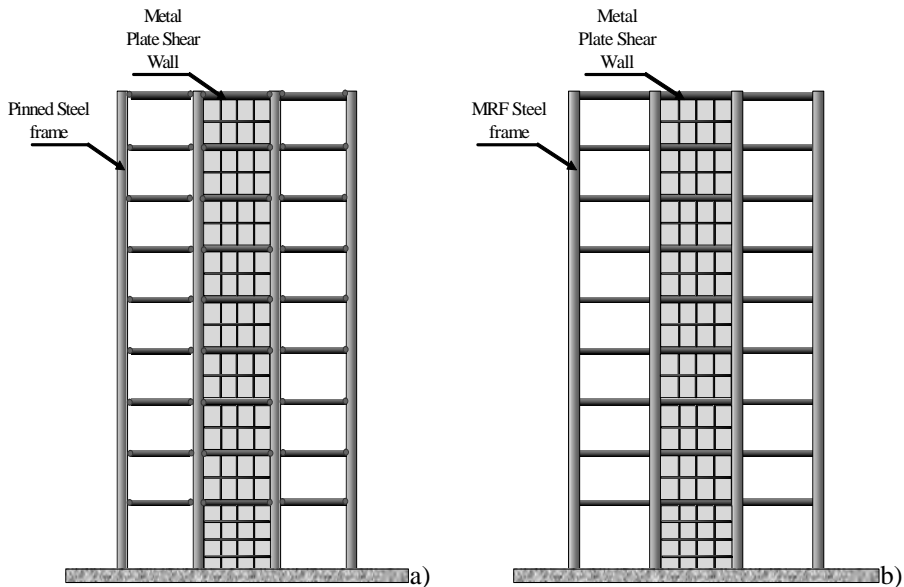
Typical steel structural system with metal plate shear walls: (a) Standard Structural System (SSS); (b) Dual Structural System (DSS).
